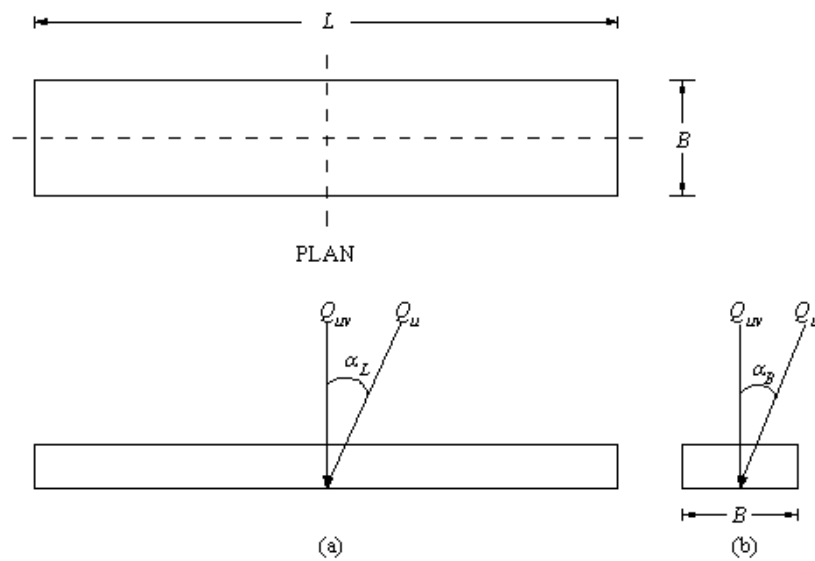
Strip footing under inclined load along (a) length and (b) breadth [Sastry and Meyerhof (1987)]
